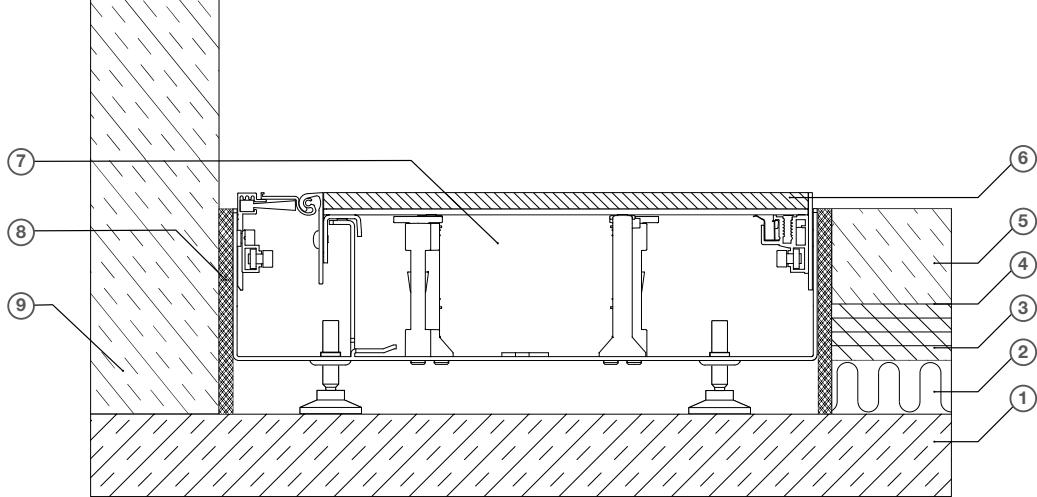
Concept drawing of the test setup for the BKBx floor trunking with brush outlet on the ceiling test station
